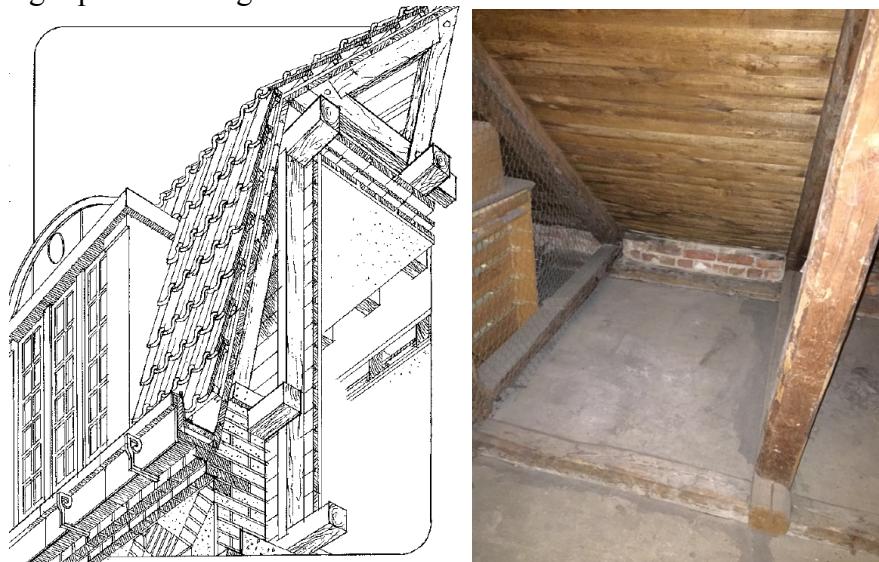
Left: Example of connection to wall, mansard roof (Björk et al., 2013). Right: View from the attic of the connection between the external wall and the roof. Notice the brick wall.
